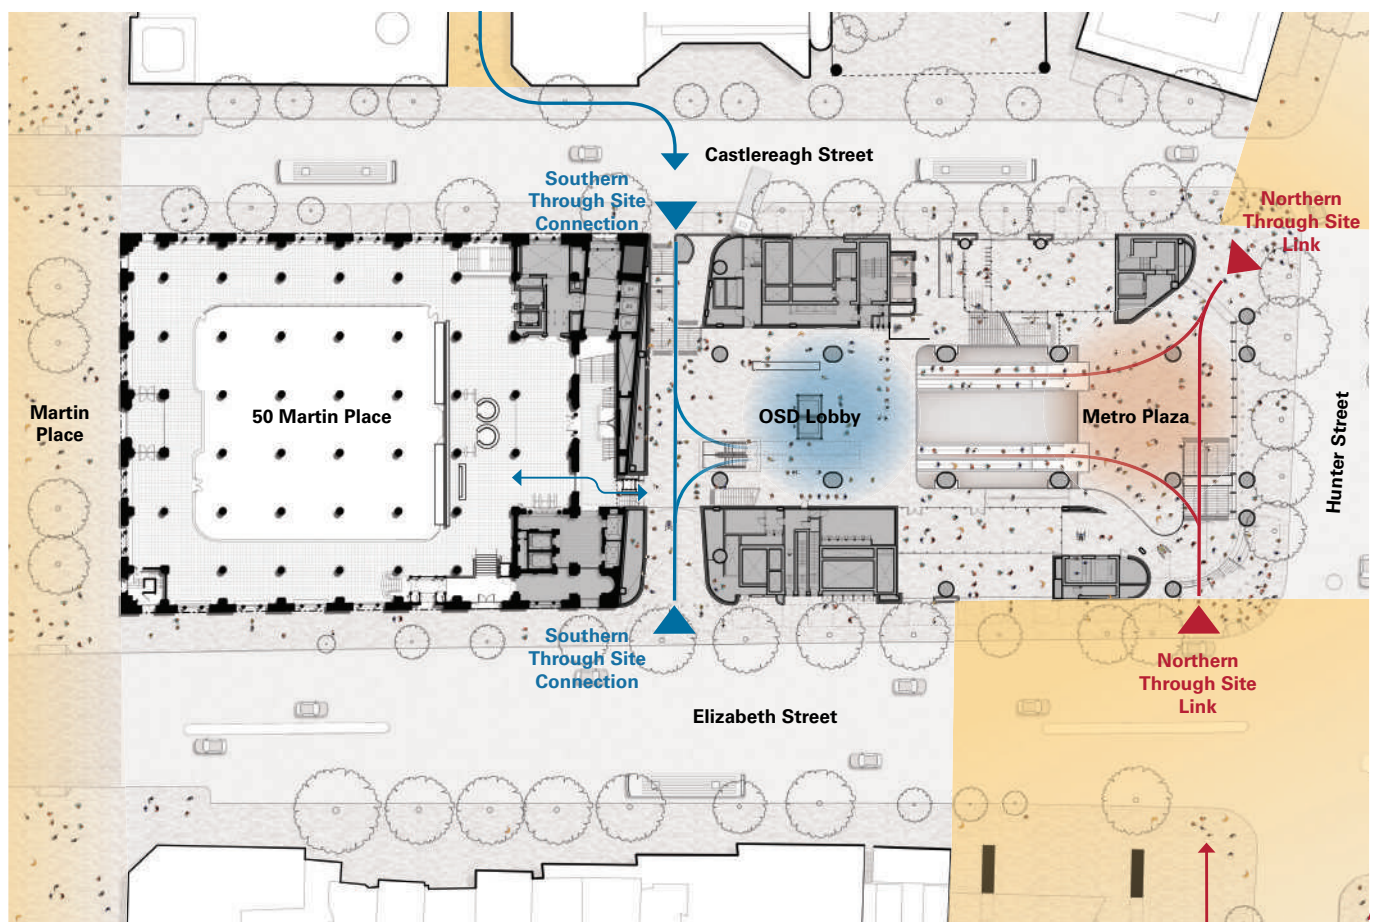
Plan showing two new east-west connections between Elizabeth Street and Castlereagh Street
